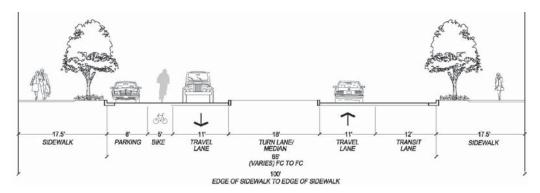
Recommended cross-section for 12th Street S. looking west between Crystal Drive and S. Clark/Bell Street
